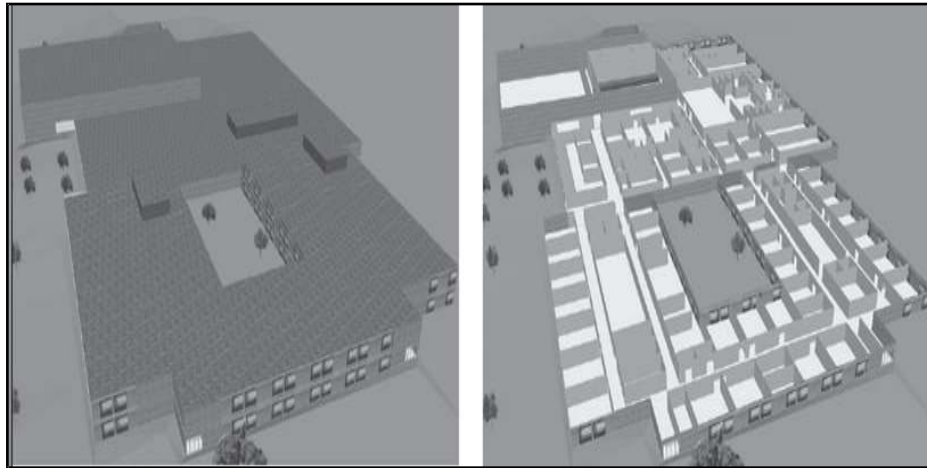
A building can be modeled in both its exterior presentation and with its interior detail by storing each floor of the building as a multi-patch. This allows the GIS to treat each floor as a layer and store separate attributes related only to that floor.
